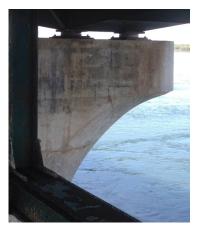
Medium Vertical Cracks at Flared Corbel, Typical
